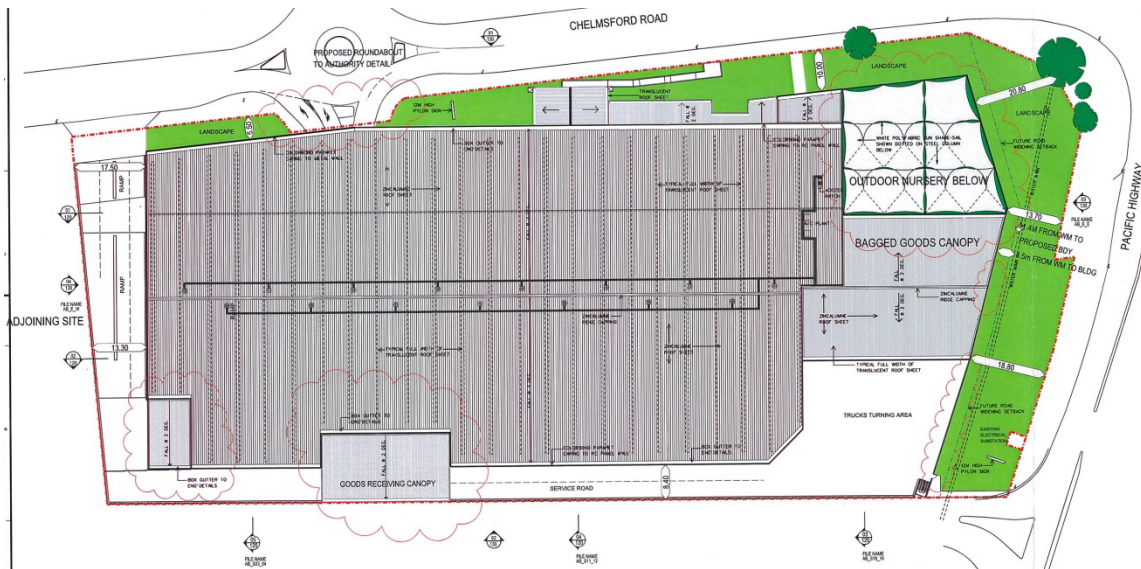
Plan of roof, outdoor nursery and bagged goods canopies
